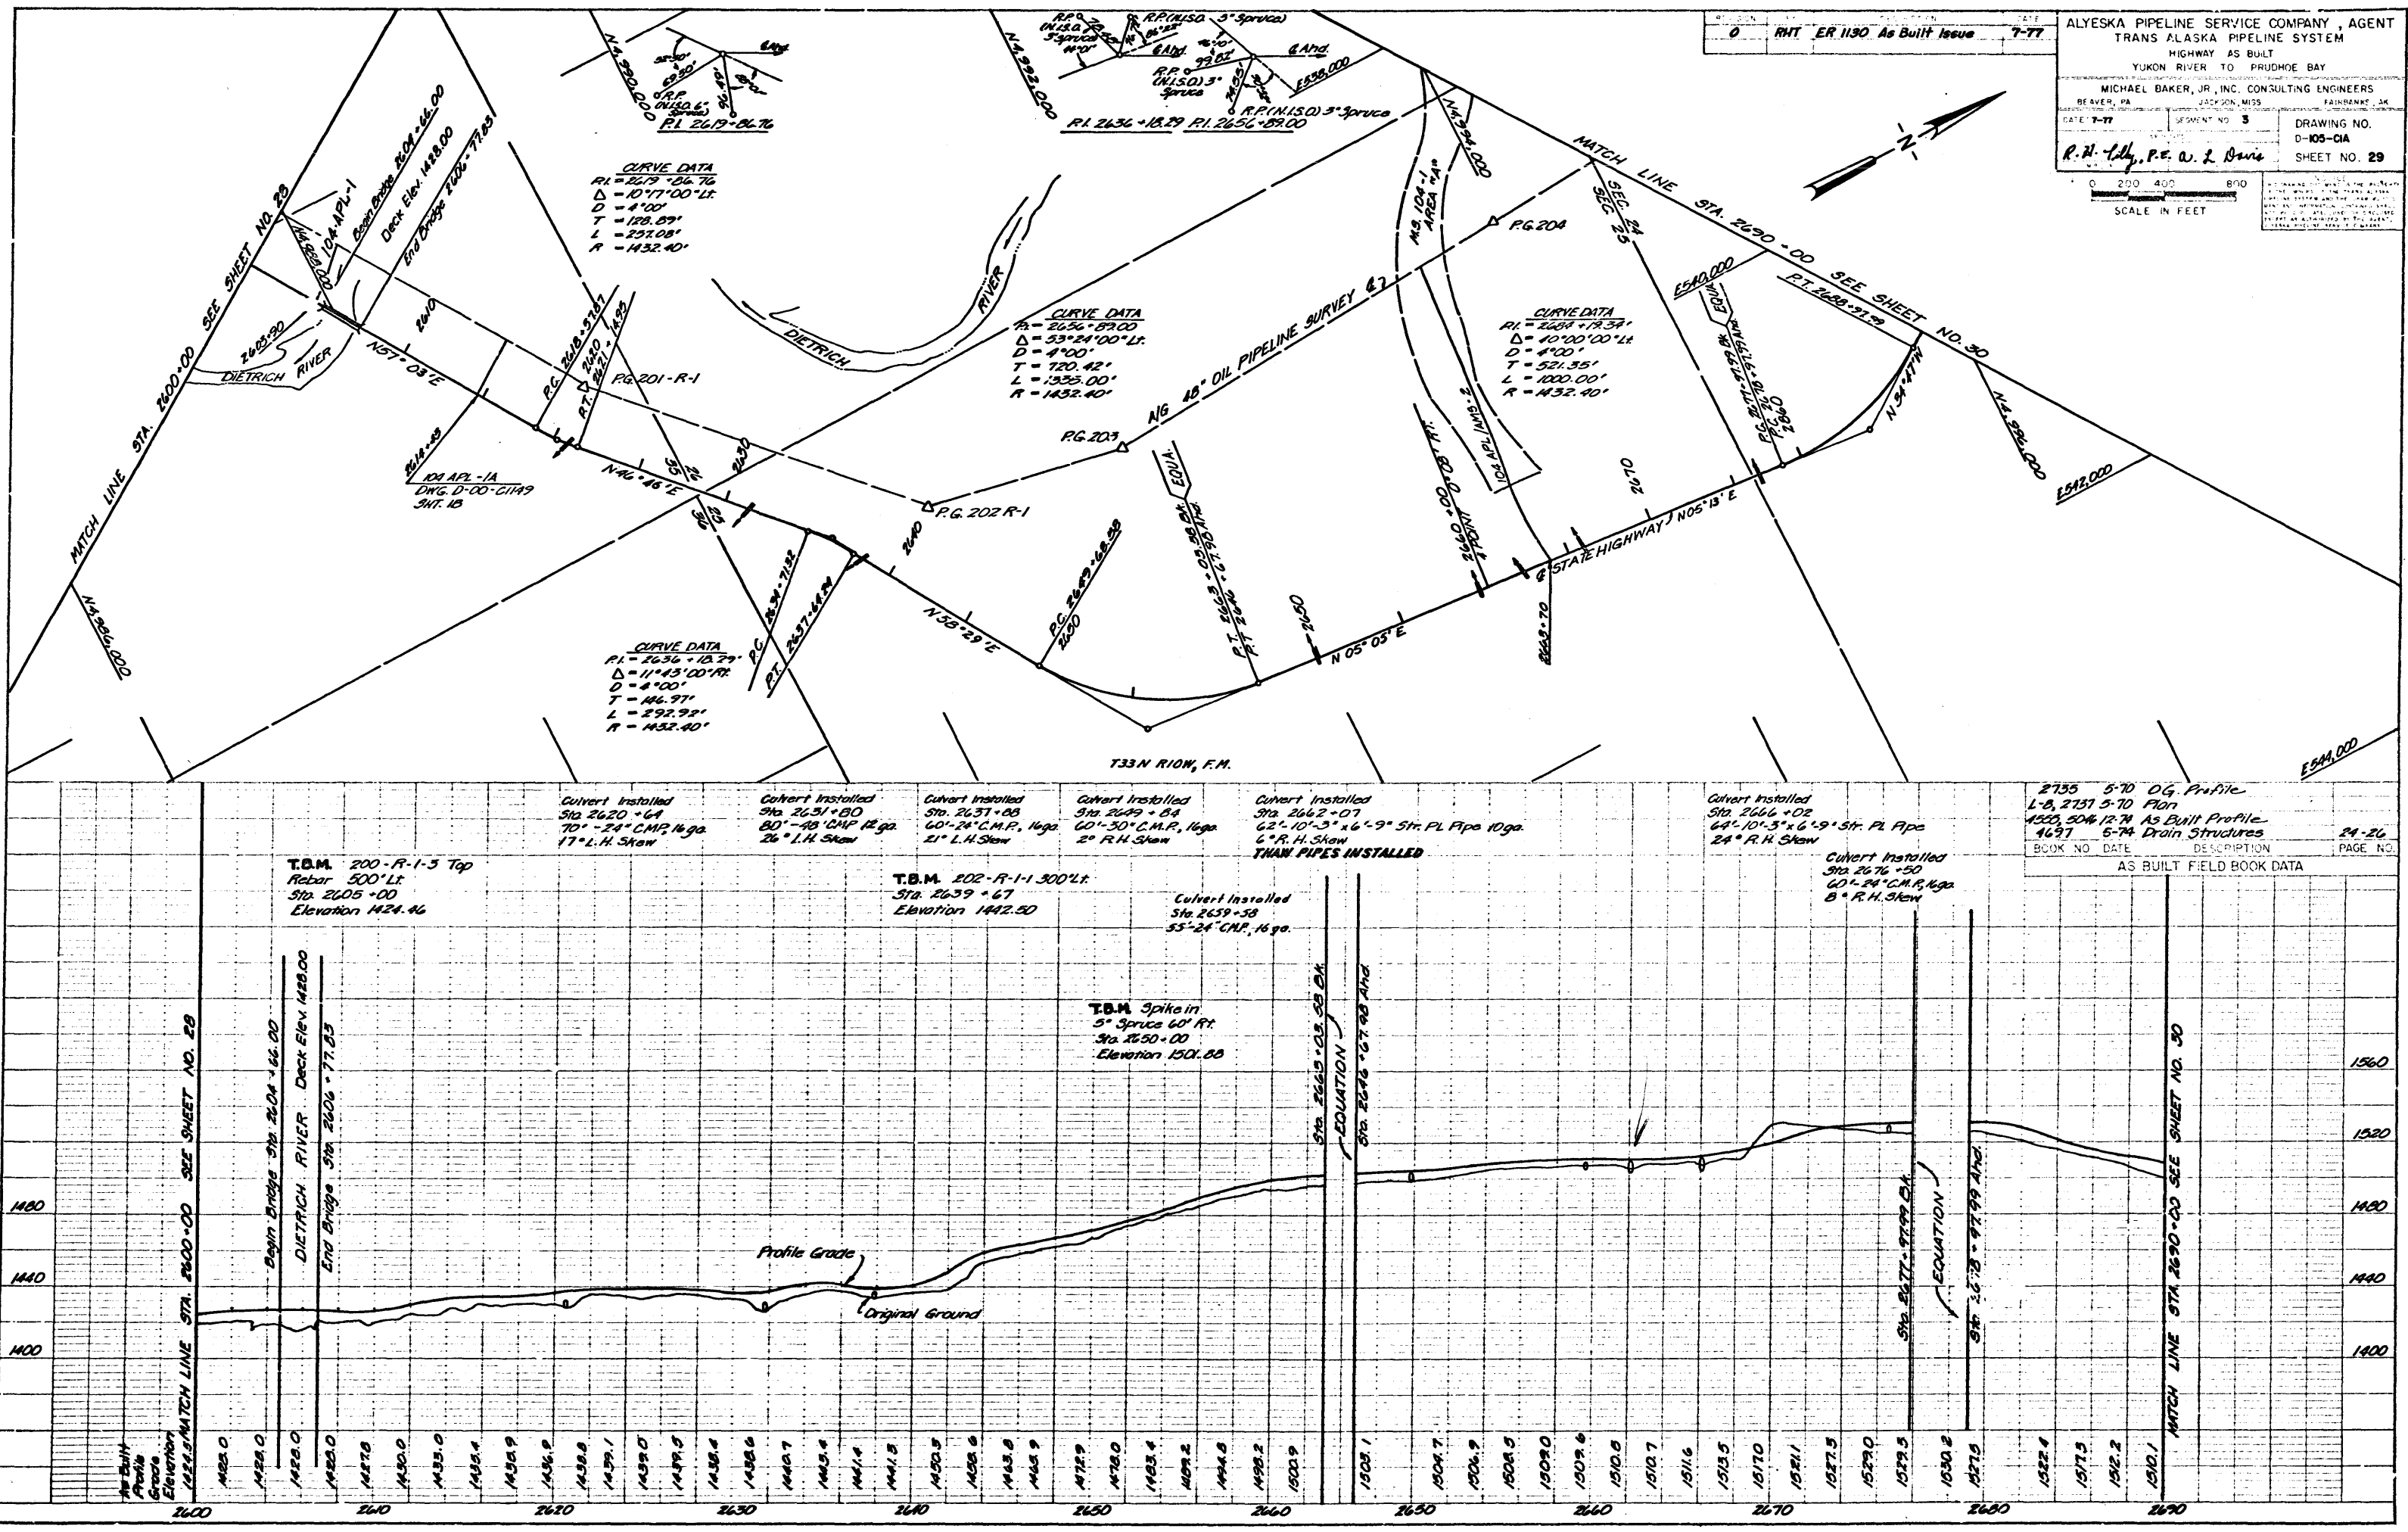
PLAN-PROFILE B.P.R. STANDARD
